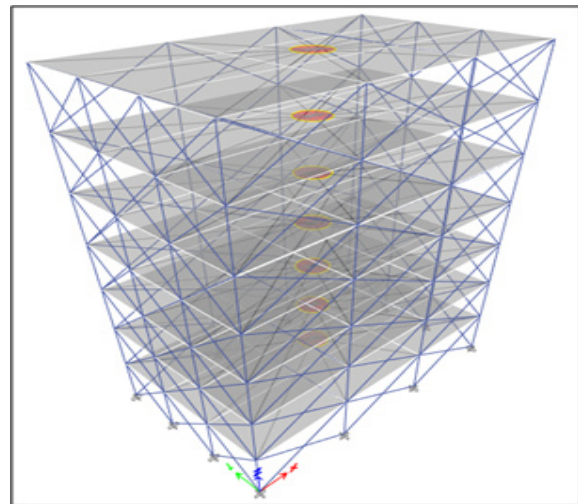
Shows In-Filled Frame Single Strut Approach from 1st Story (Model-2).
